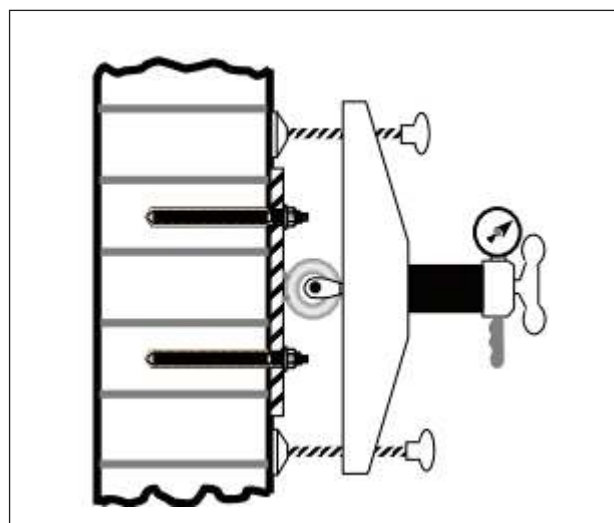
, Bridge large enough to span the plate to test all 4 fixings via the eye
